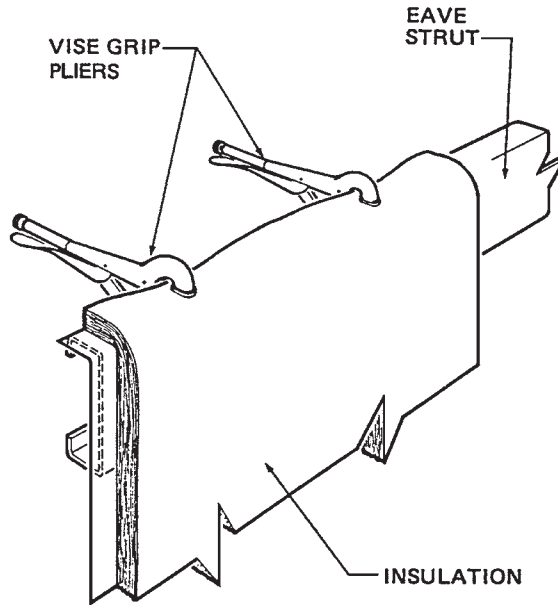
Temporary attachment of fiberglass wall insulation to eave strut. (Butler Manufacturing Co.)
